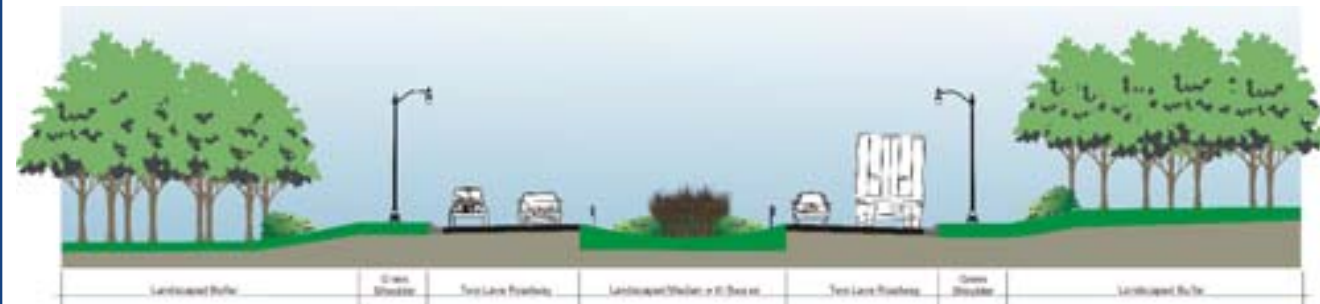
Typical Cross-Section Between Pennsylvania Avenue and East Capitol Street (landscaped median and reinforced grass shoulders)
